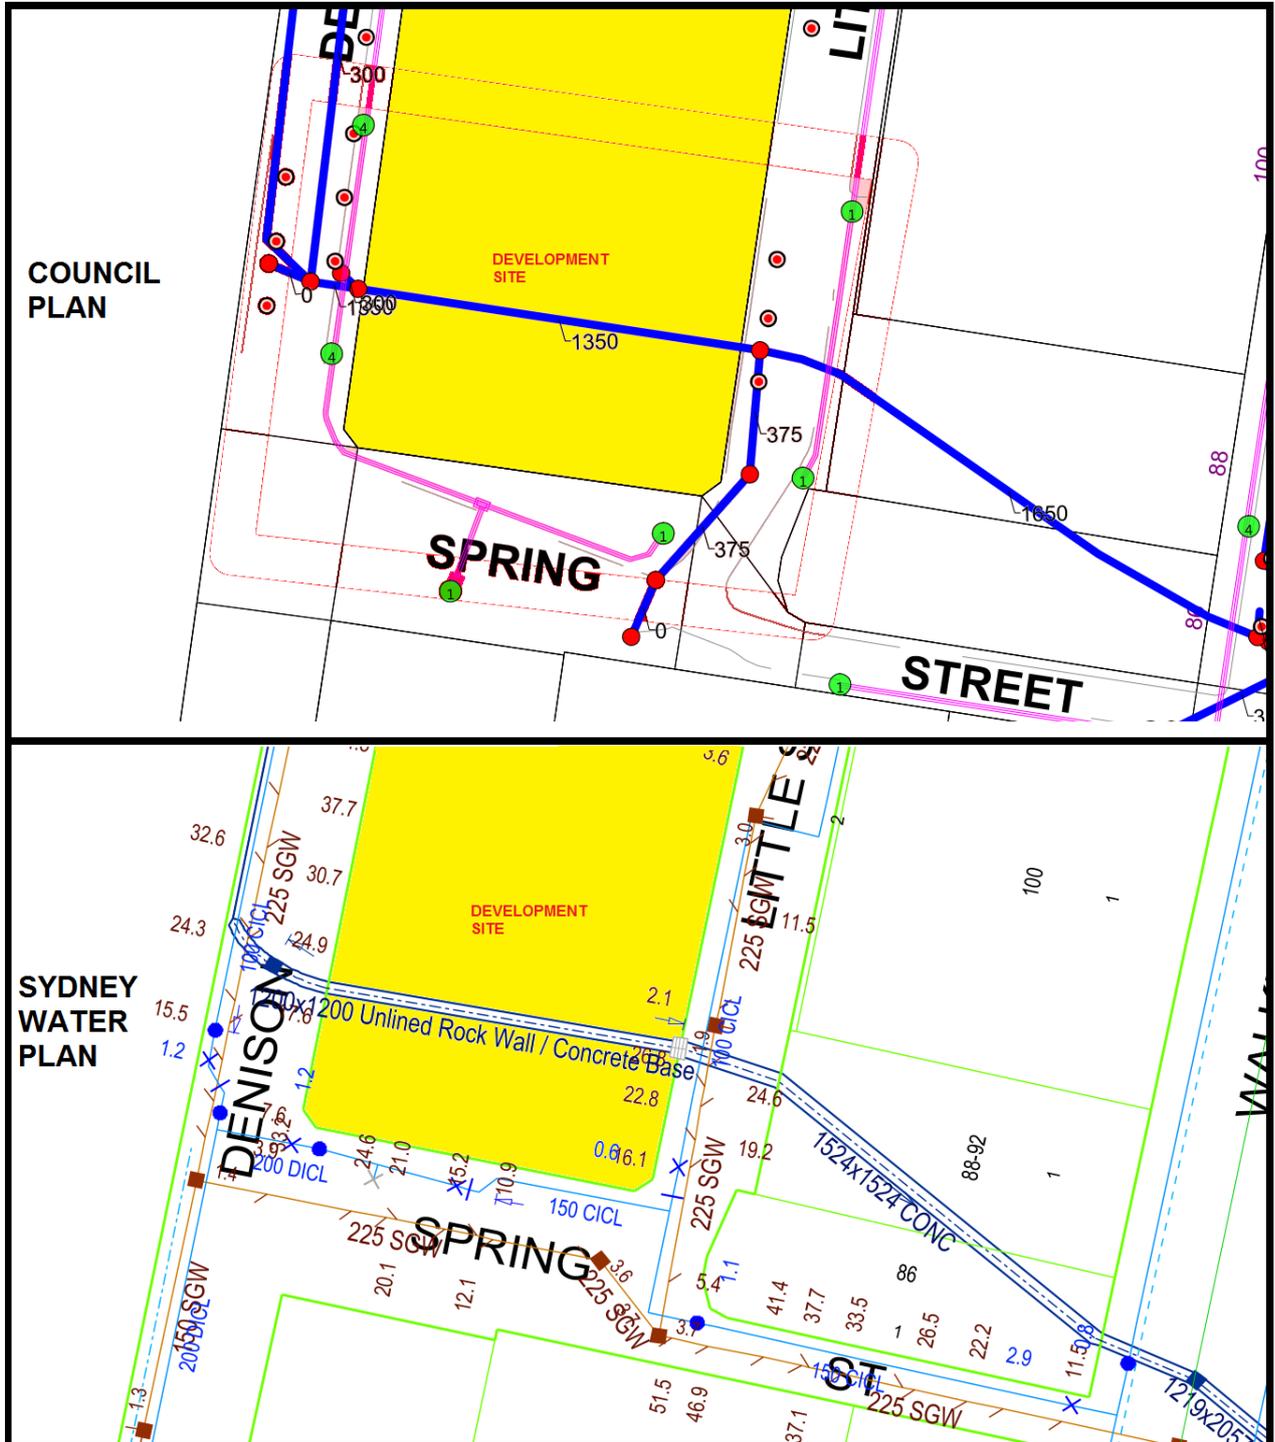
North Sydney Council and Sydney Water plans of existing stormwater asset
